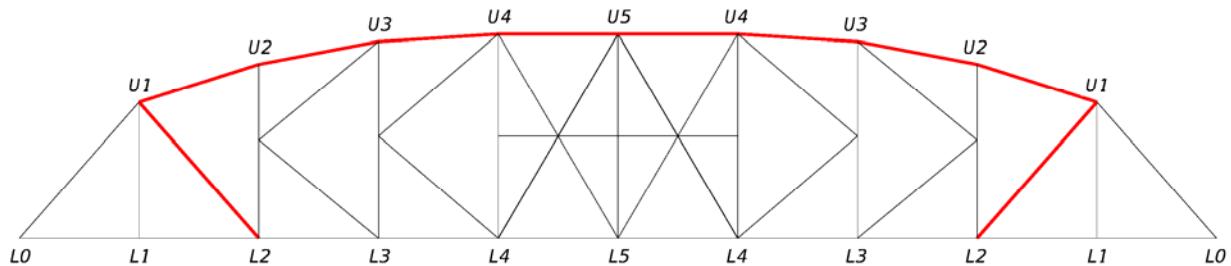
Main Through Truss Span Members Overstressed Due to Pedestrian Loads
